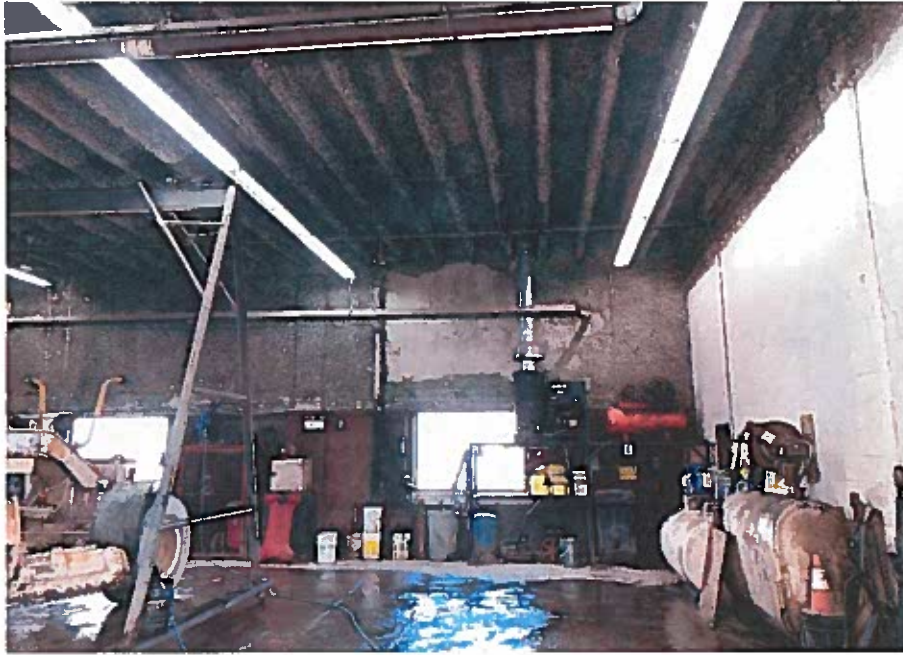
View Looking North, Note Spray on Product on Exterior Wall Has Come Off
